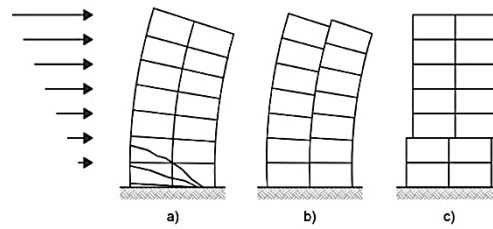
Seismic behaviour of RC structural walls composed of prefabricated wall panels: a) monolithic behaviour; b) weak vertical joints, and c) weak horizontal joints (based on [28])
